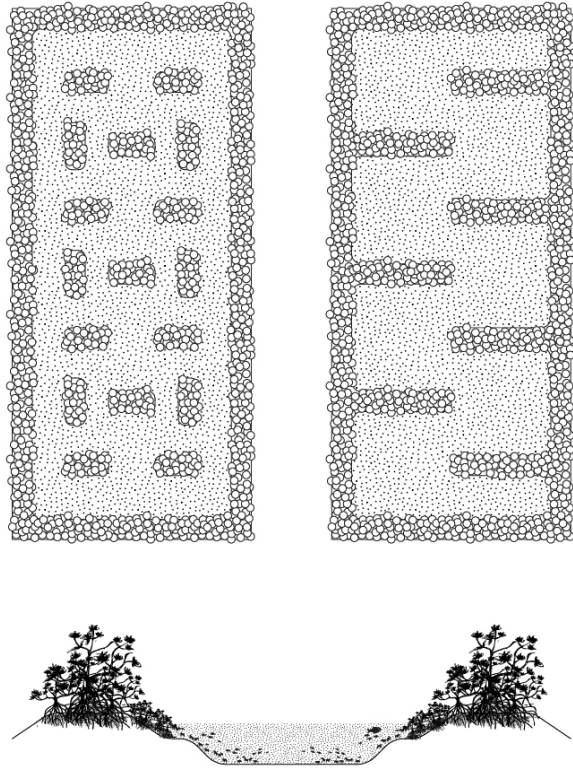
typical plan and section of mangrove based shrimp farming techniques
